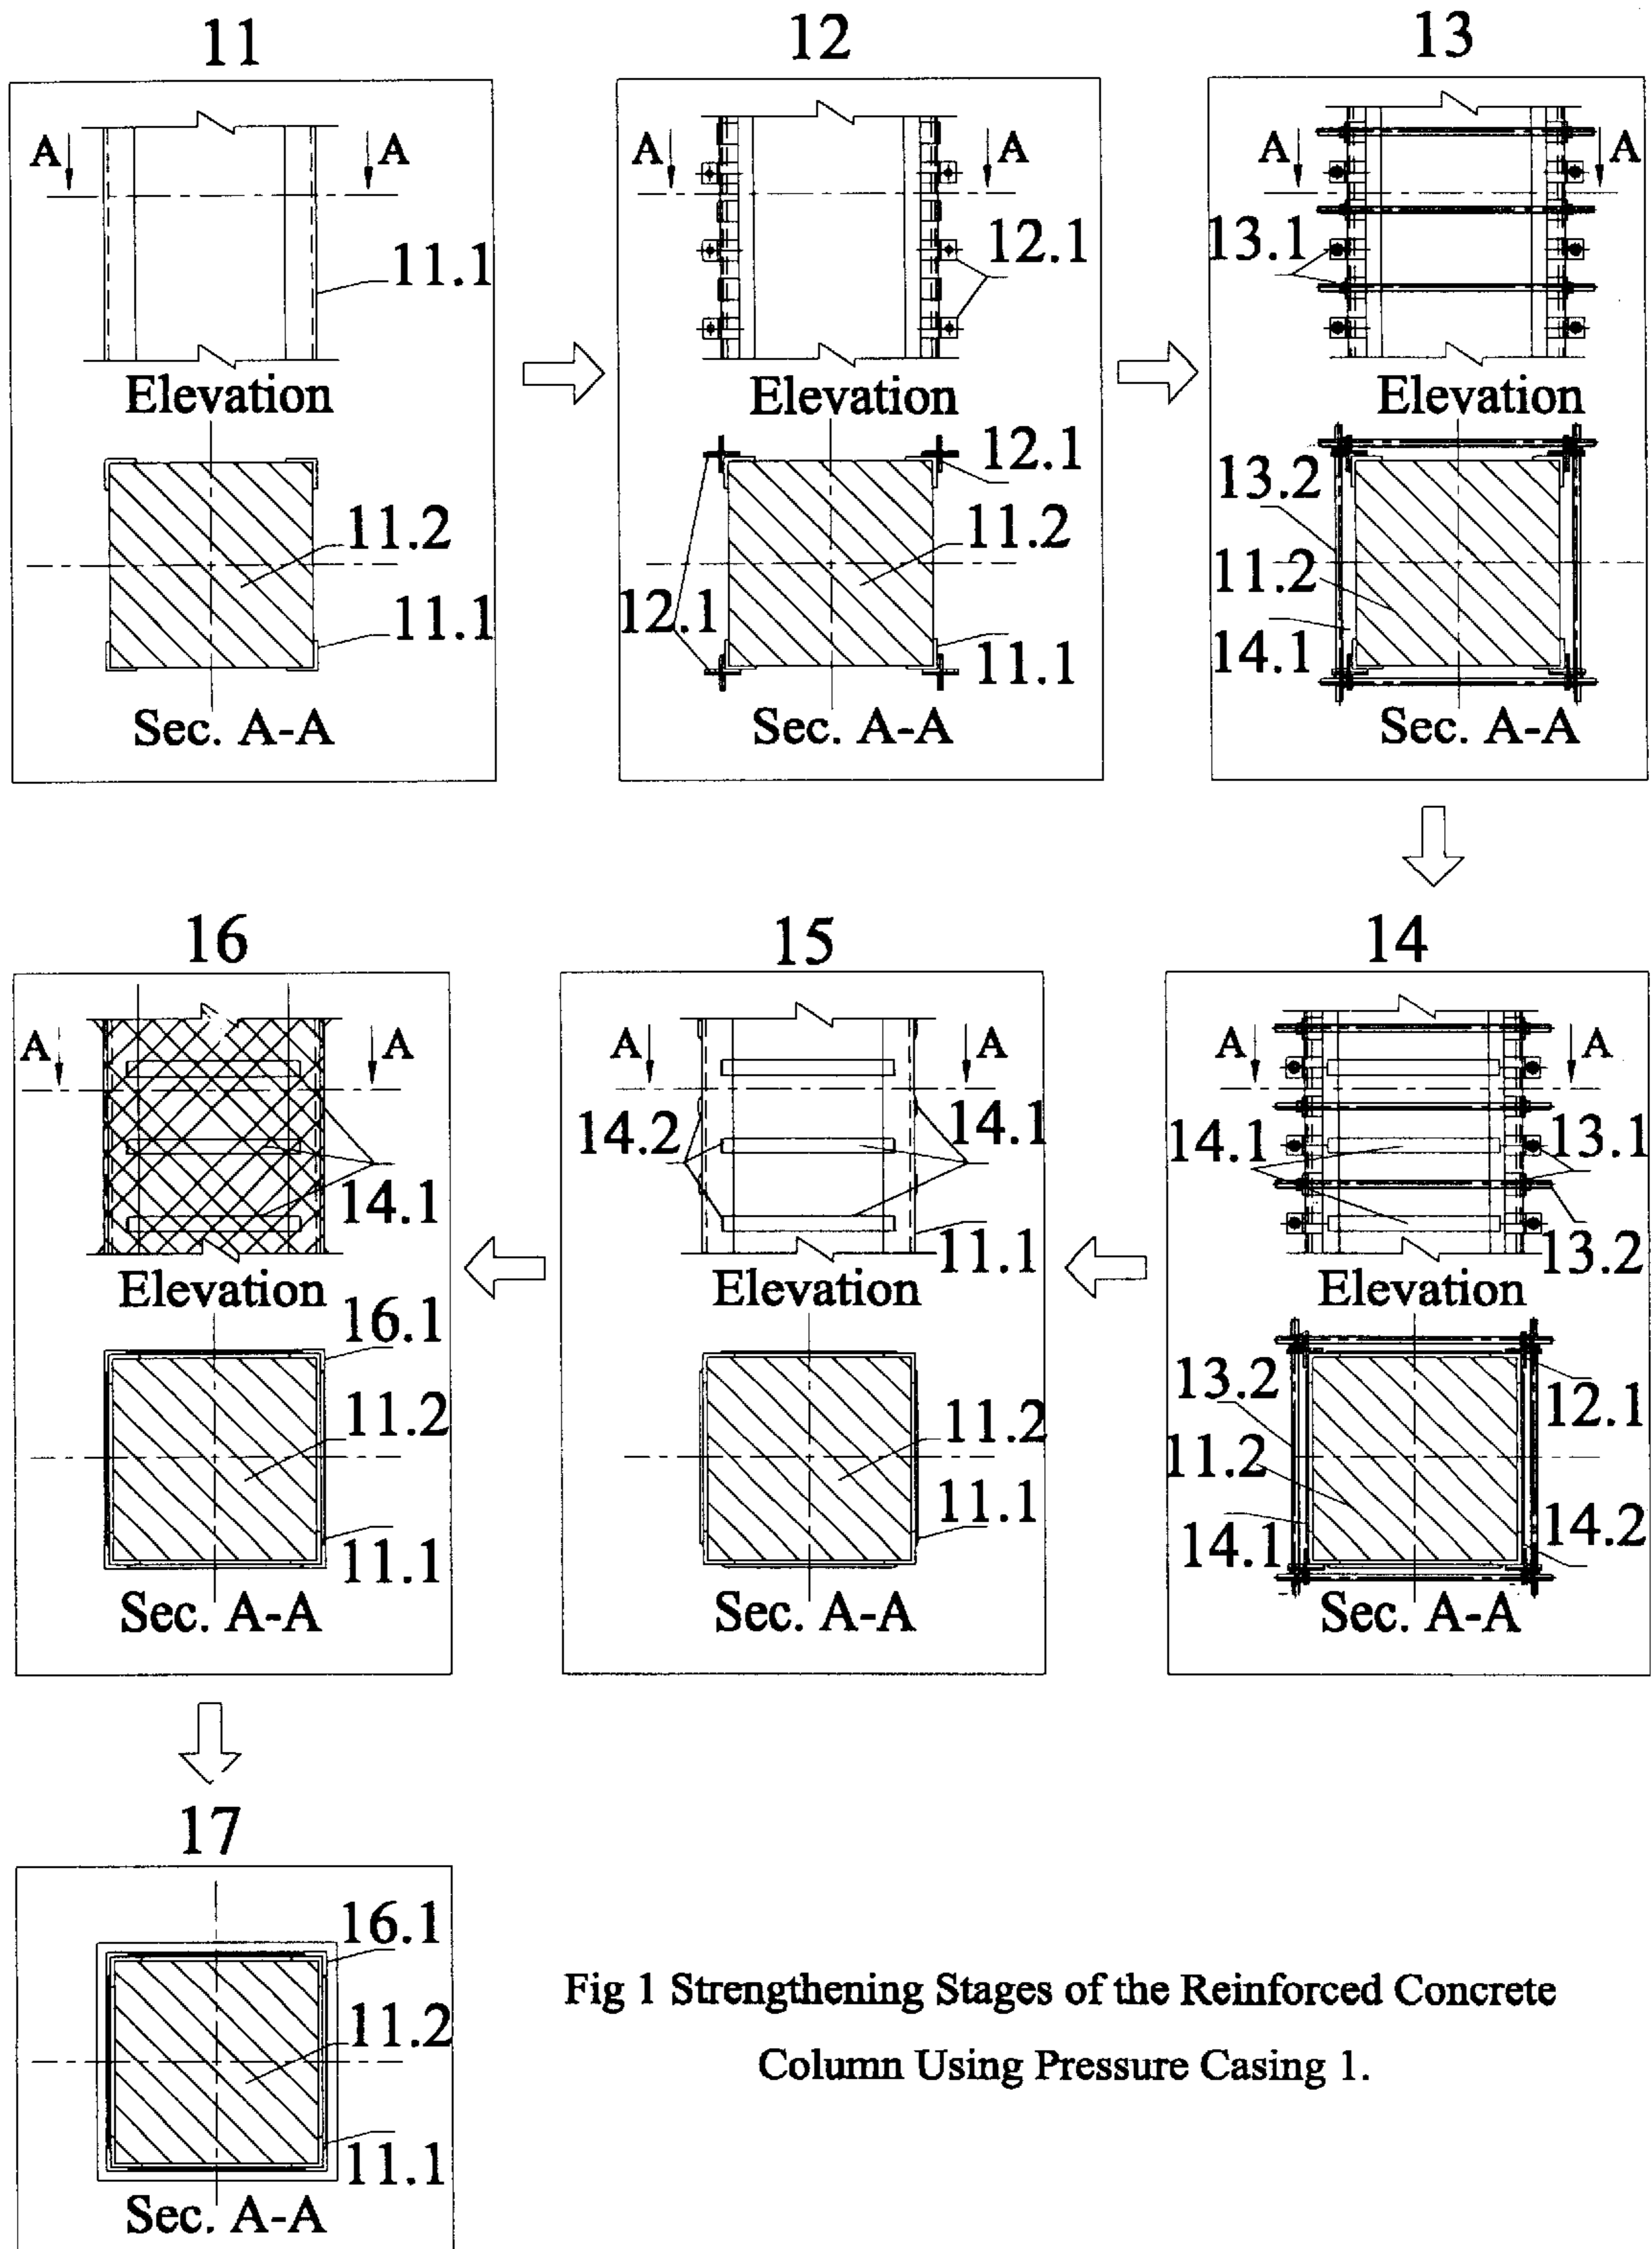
Strengthening Stages of the Reinforced Concrete Column Using Pressure Casing 1.
